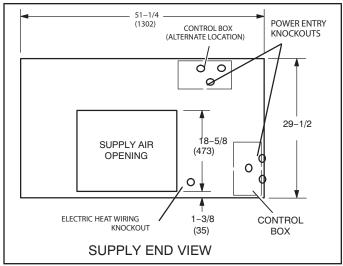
TAA 072 and 090 Knockout Location – Dimensions – inches (mm)
